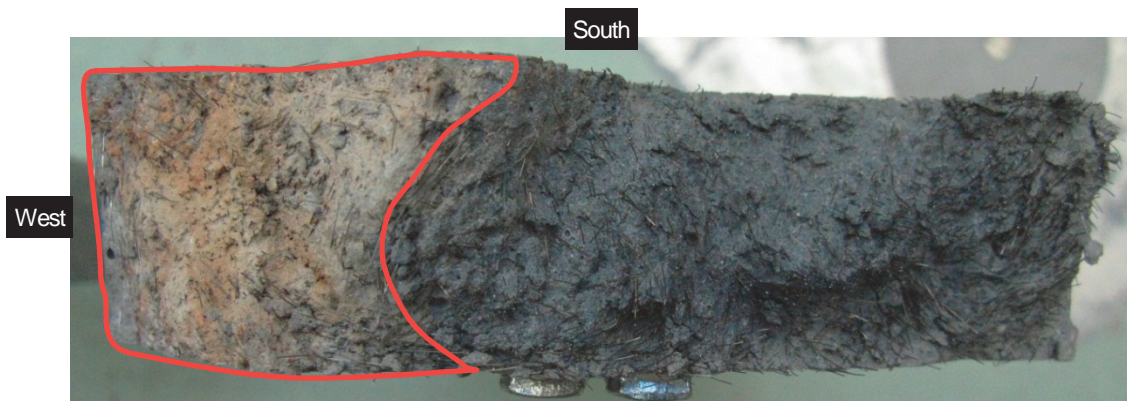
Fatigue fracture surface of S3-8 test specimen (upper half of the fractured specimen)
